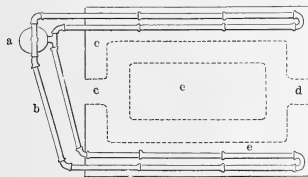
GROUND PLAN OF AMATEUR GREENHOUSE.
